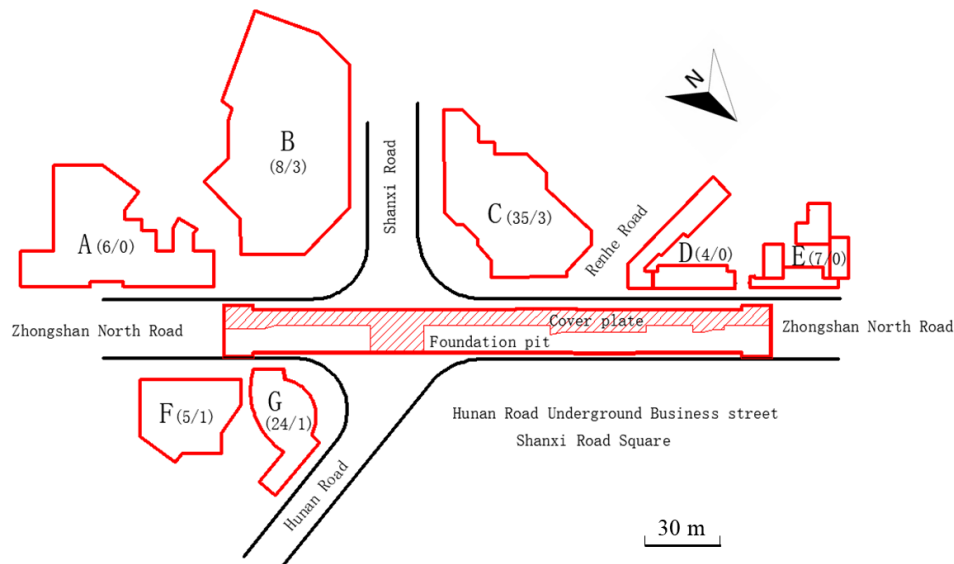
Positional relations of the buildings around the station (A (6/0) means building A has 6 storeys and 0 basement storeys)
